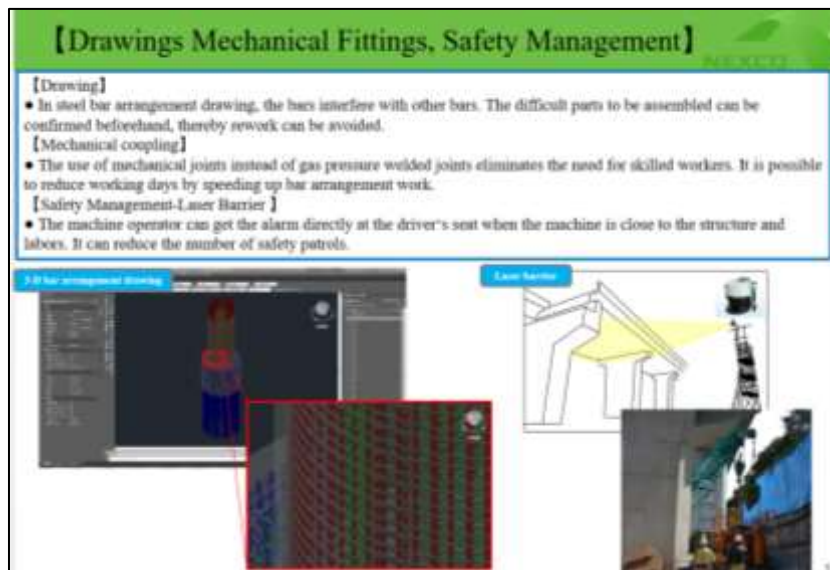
Drawings, Mechanical Fittings and Safety Management using BIM
